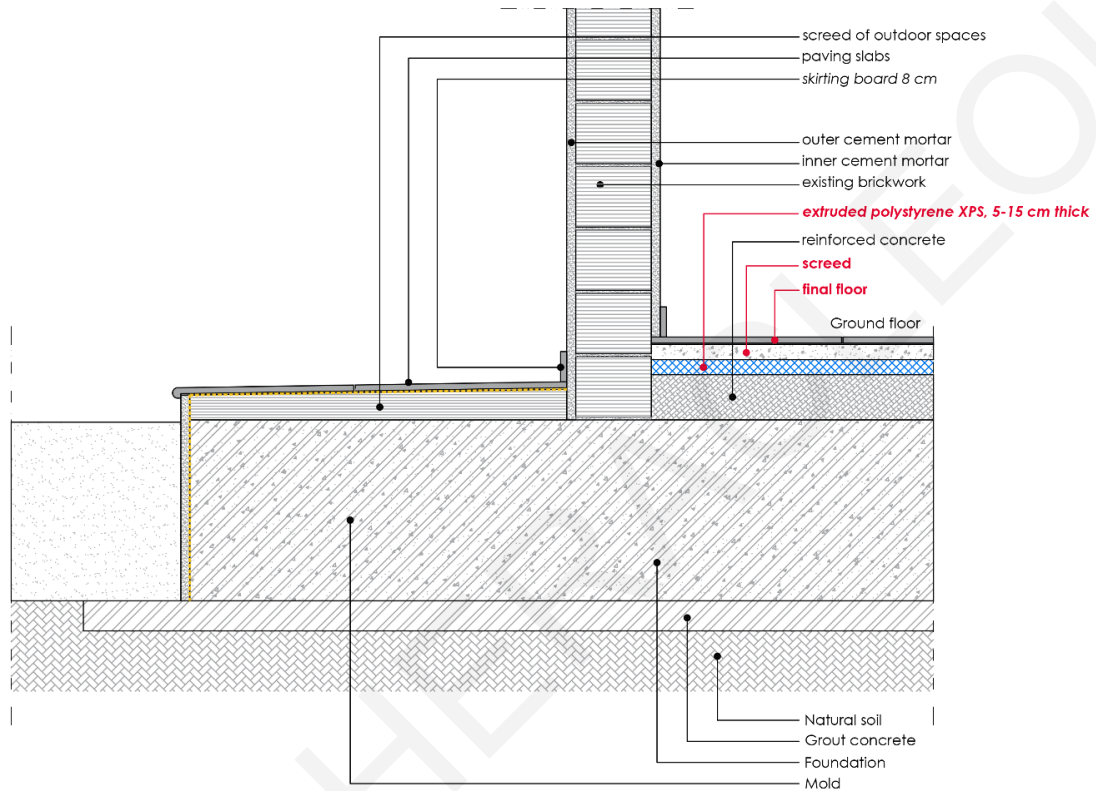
Construction detail of floor in contact with ground including thermal insulation.
